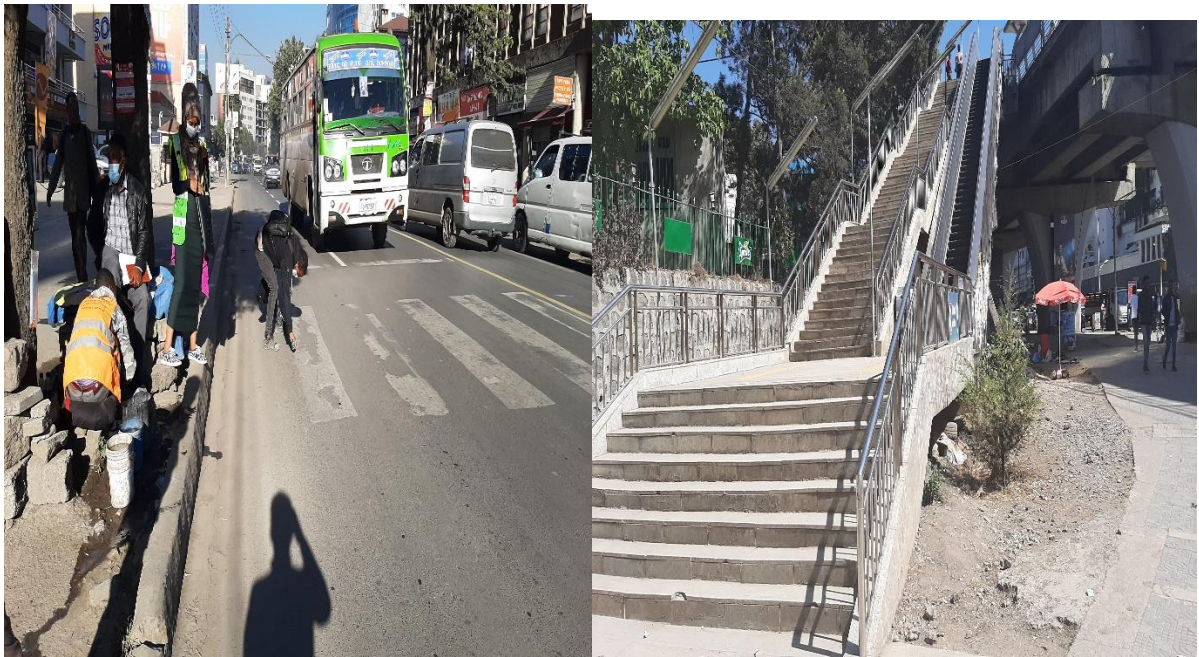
60: Raised edge at crossing and lack of ramp for wheelchair users to climp the bridge
